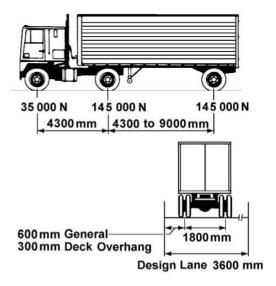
Truck load coming to bridge (AASHTO, 2007)
